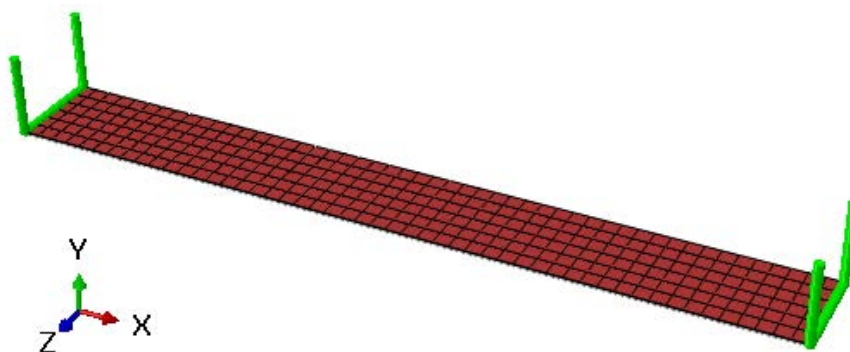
Model with mechanical anchored FRP sheets at each end of column with steel U-section (green lines)
